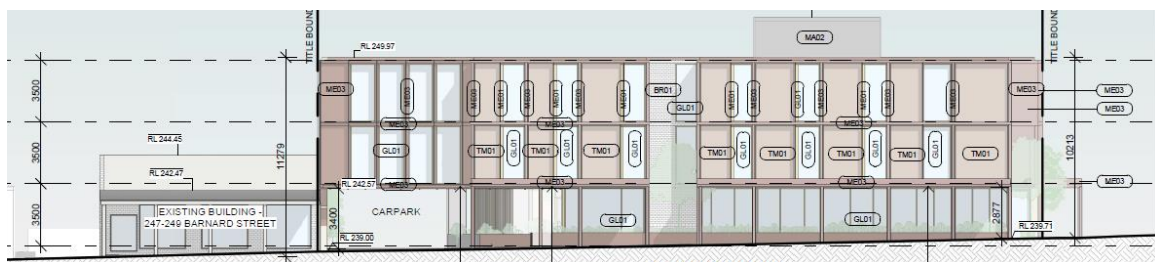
Barnard Street elevation. Source: Life Architecture, 2026.
